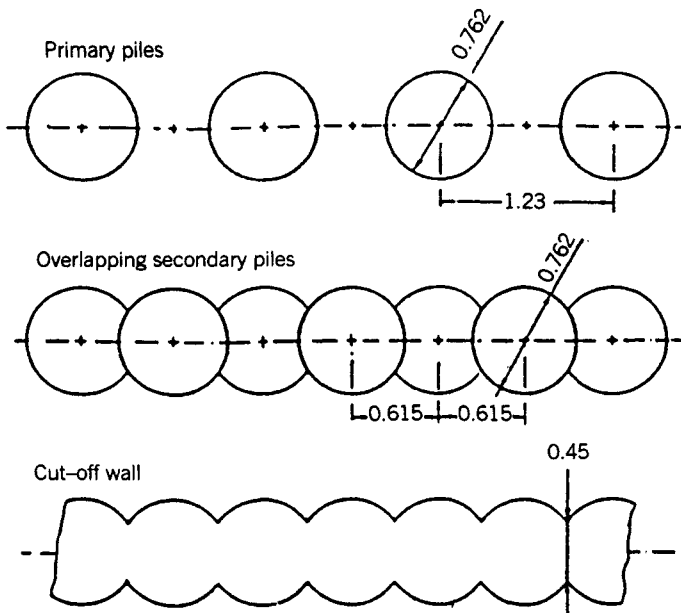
Construction sequence of the cutoff wall for the Khao Laem dam.
